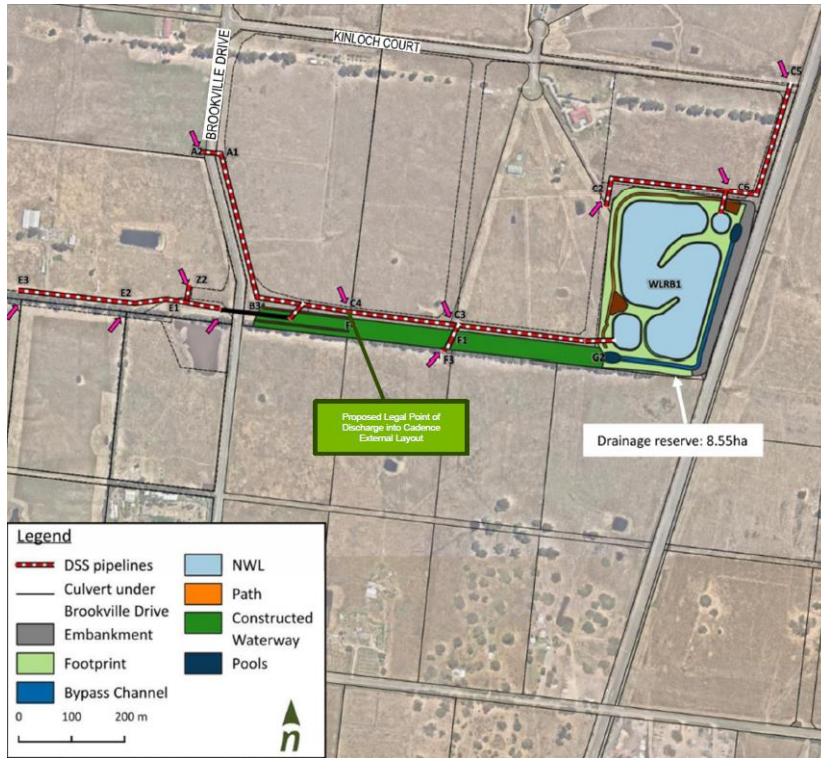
Alternative site drainage layout (Source: Stormwater Management Strategy and Stormwater Management Plan)
